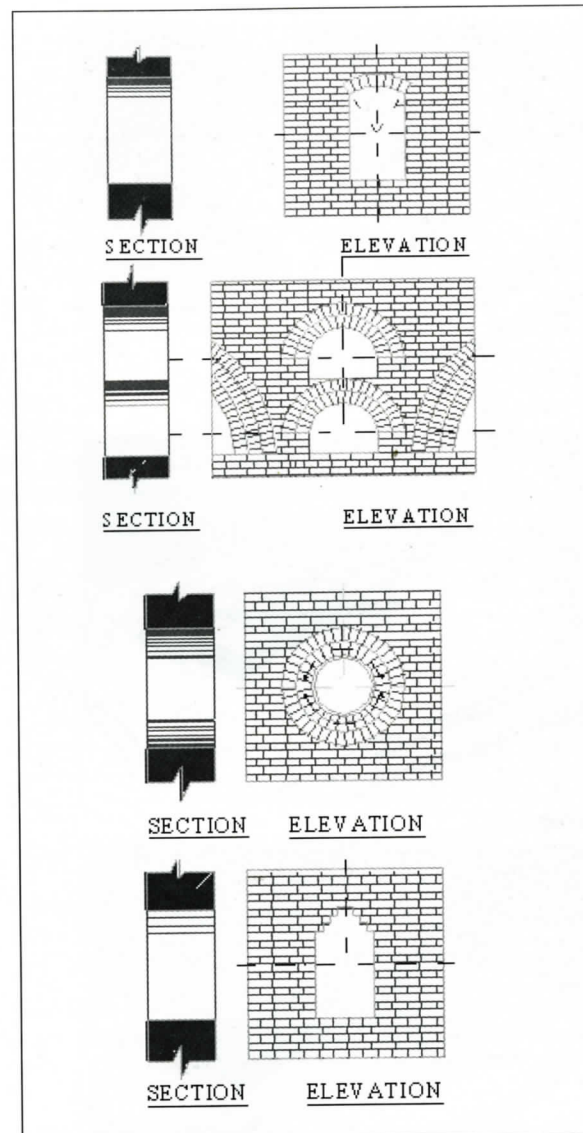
Treatment of openings in the walls and elevation of Chittagong Court Building
